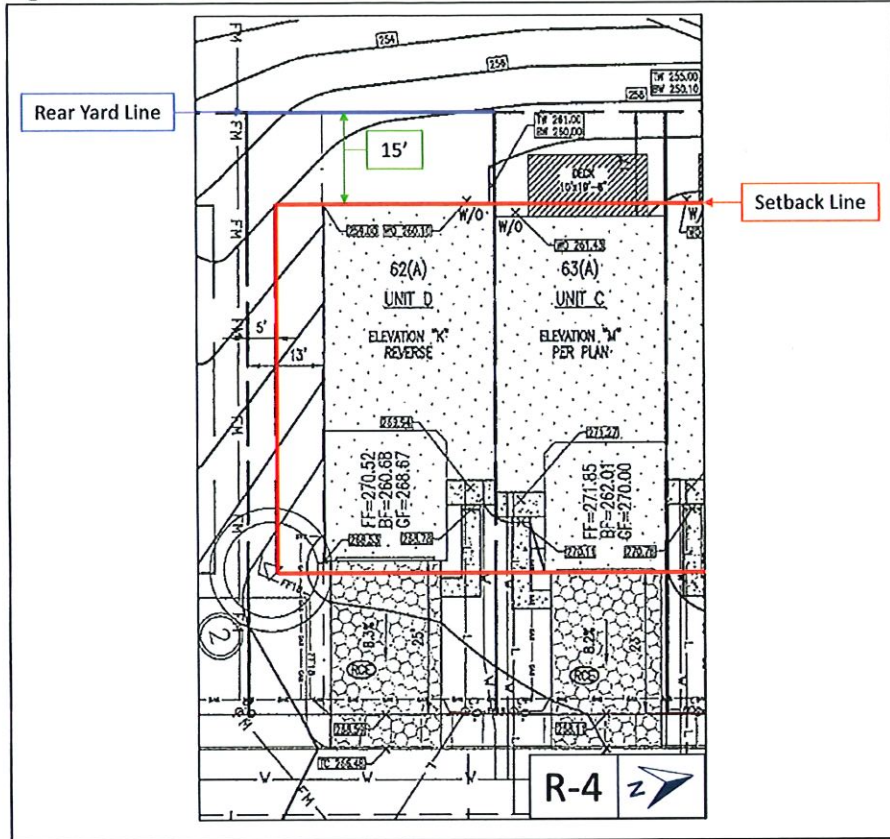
The location, dimensions and proposed use of all buildings and structures as well as the distance of all buildings and structures to the property lines.
